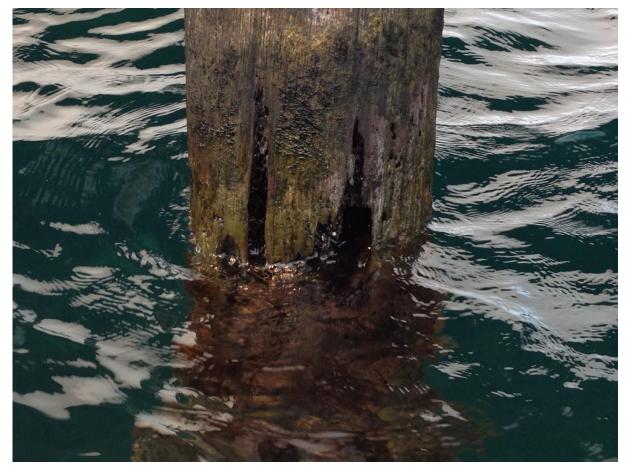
71 South 17/11/15 – Severe section loss at surface (surface inspected only)
